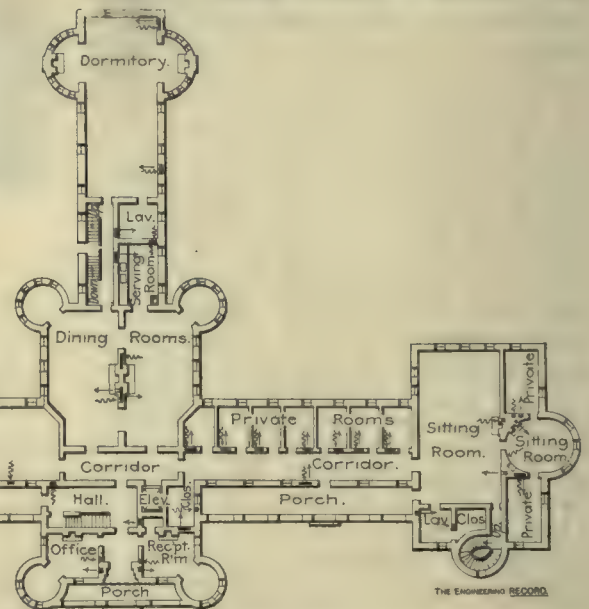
FIRST FLOOR, HOSPITAL BUILDING.
